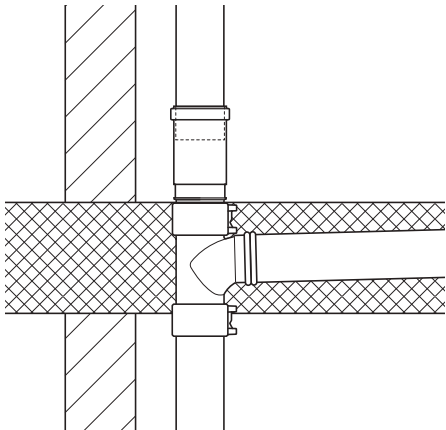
Equal branch fitting 88.5° , embedded in concrete
